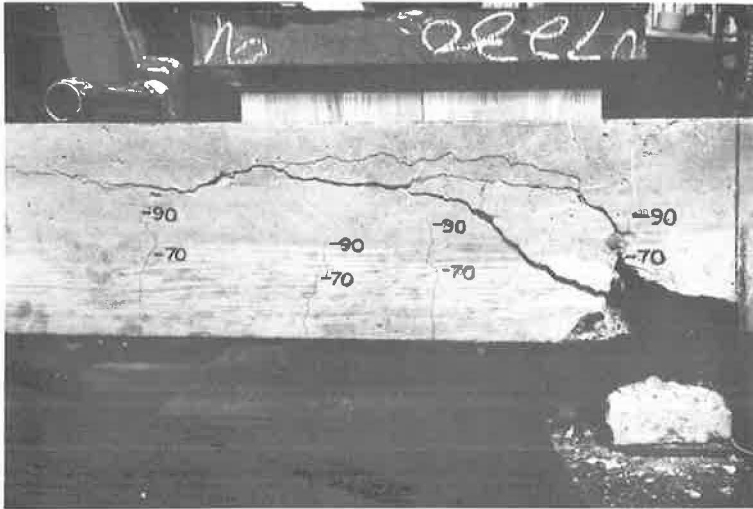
View of transverse face of failed test unit with 4-in. stud spacing; large failure cracks developed suddenly at main load of 99,000 lb.
